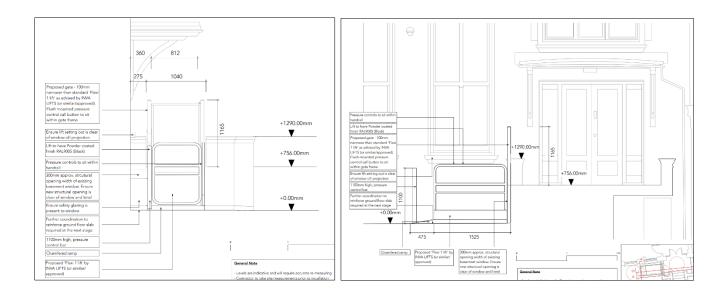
Proposed Section (left) and Front Elevations (Right) – see submission drawings
